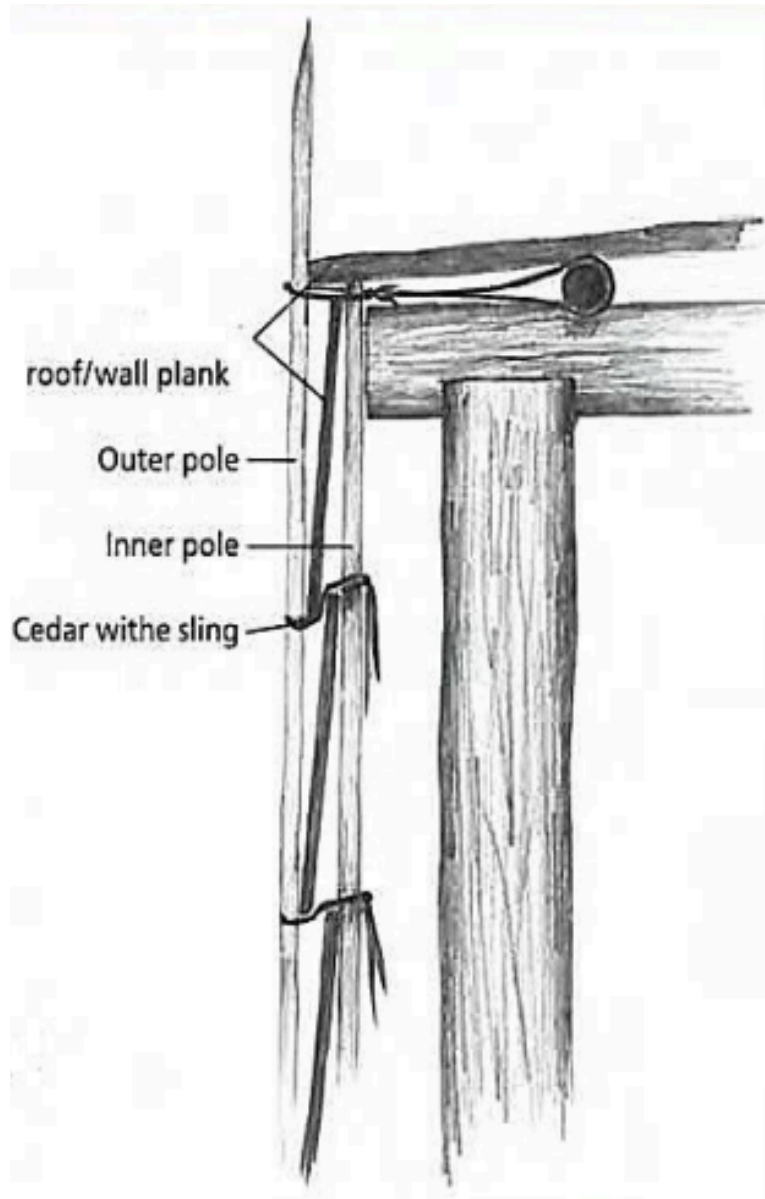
Detail of how wall and roof planks were fastened with a cedar withe, or cord, that tied to both the exterior poles and to the interior poles, from Christina Wallace, 2017.
